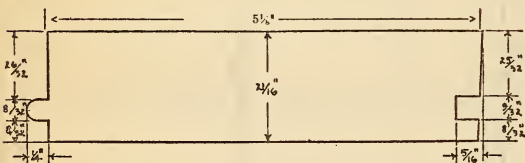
1½ by 6 inch kiln-dried flooring, green, 5⅜-inch face
